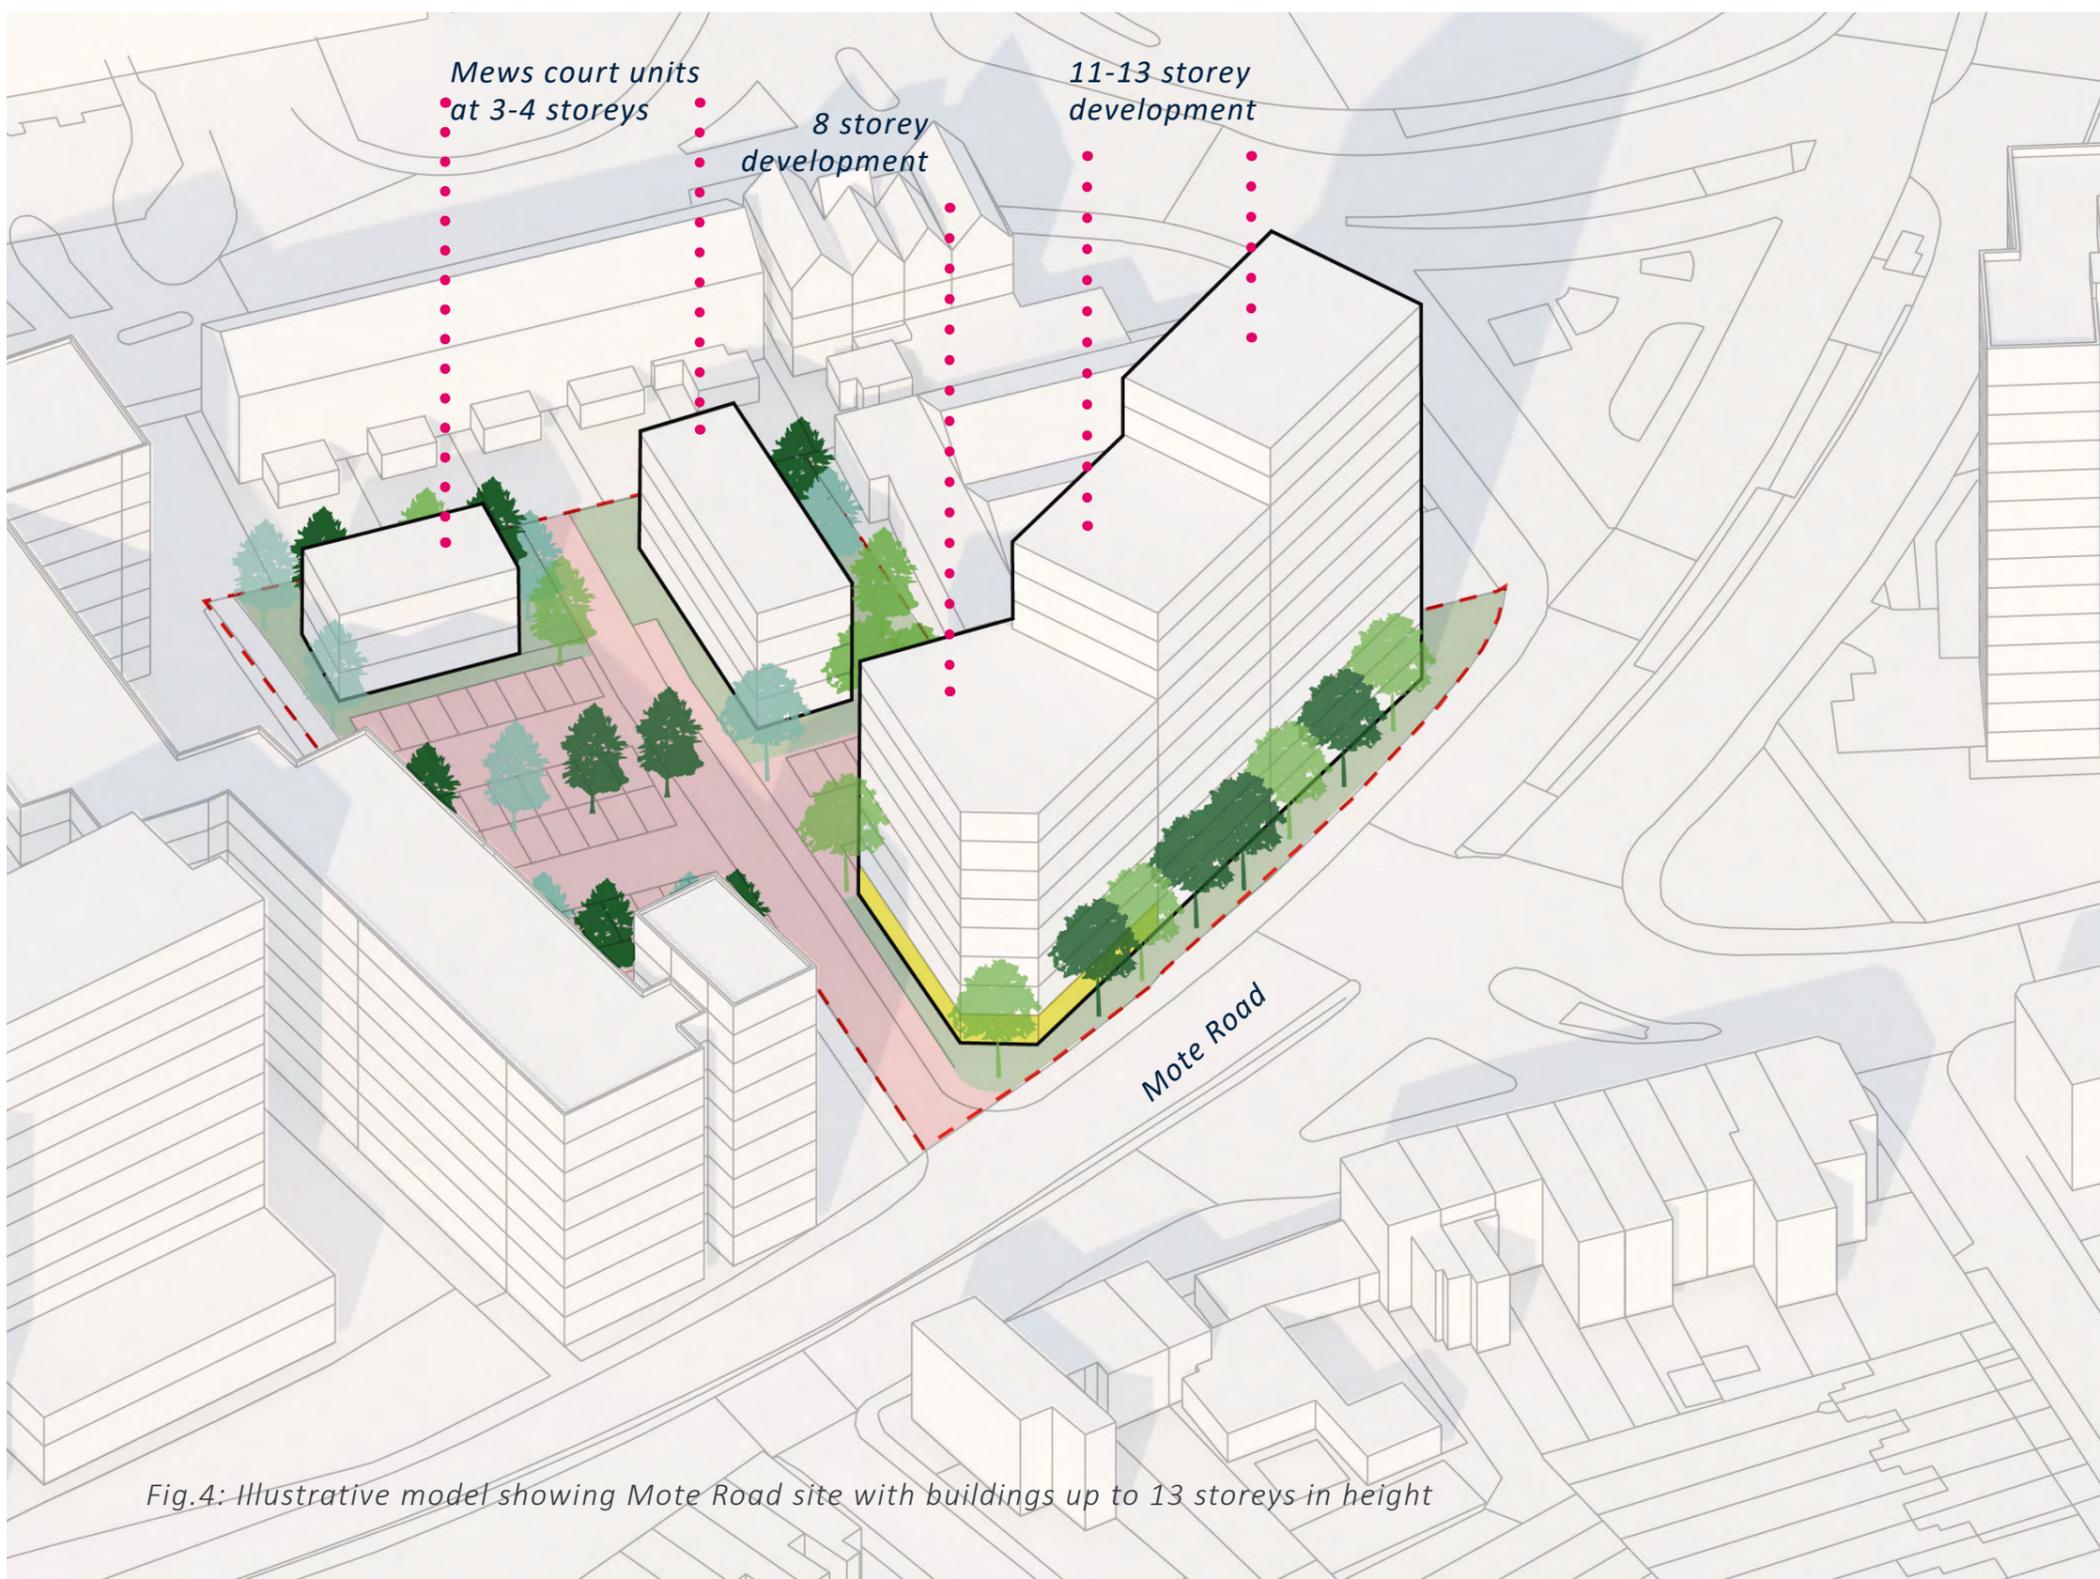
Illustrative model showing Mote Road site with buildings up to 13 storeys in height
